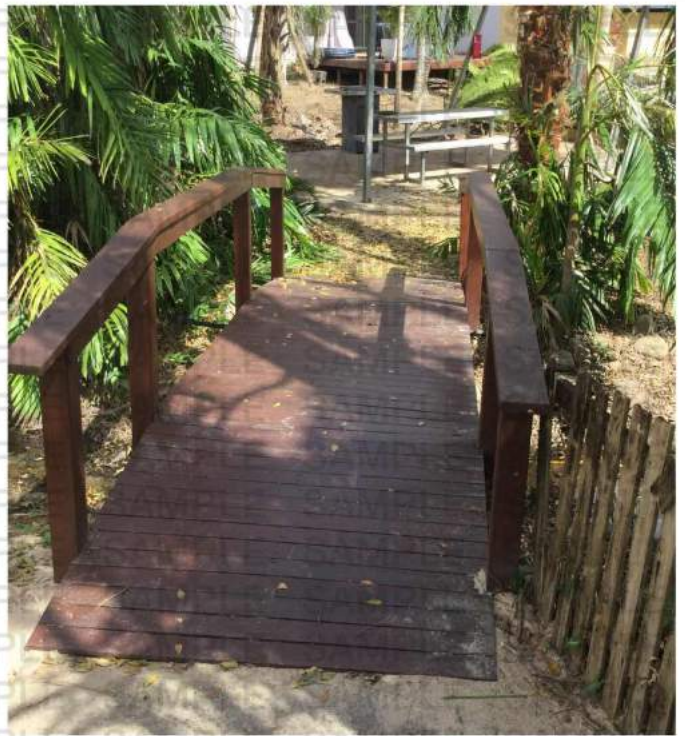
Minor repairs to timber bridge as a result of tree damage.
